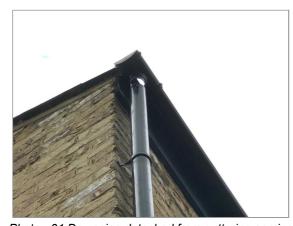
Downpipe detached from guttering serving rear outrigger roof
